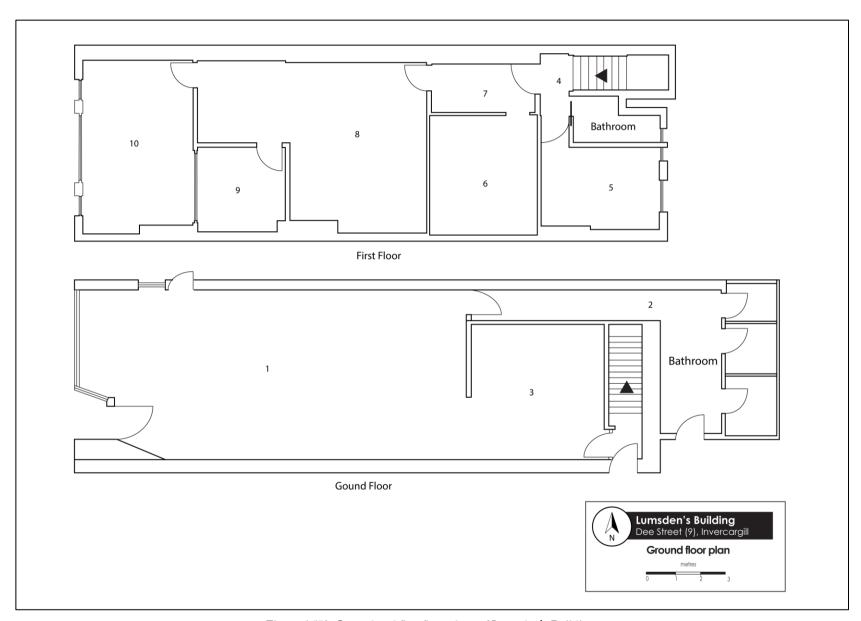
Ground and first floor plans of Lumsden's Building.
